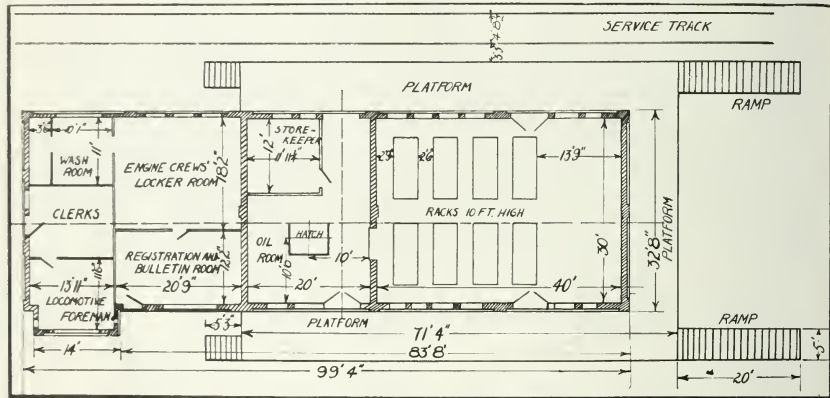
Floor plan, Stores and Office Building, Canadian National Railways Locomotive Terminal, Moncton, N.B.
